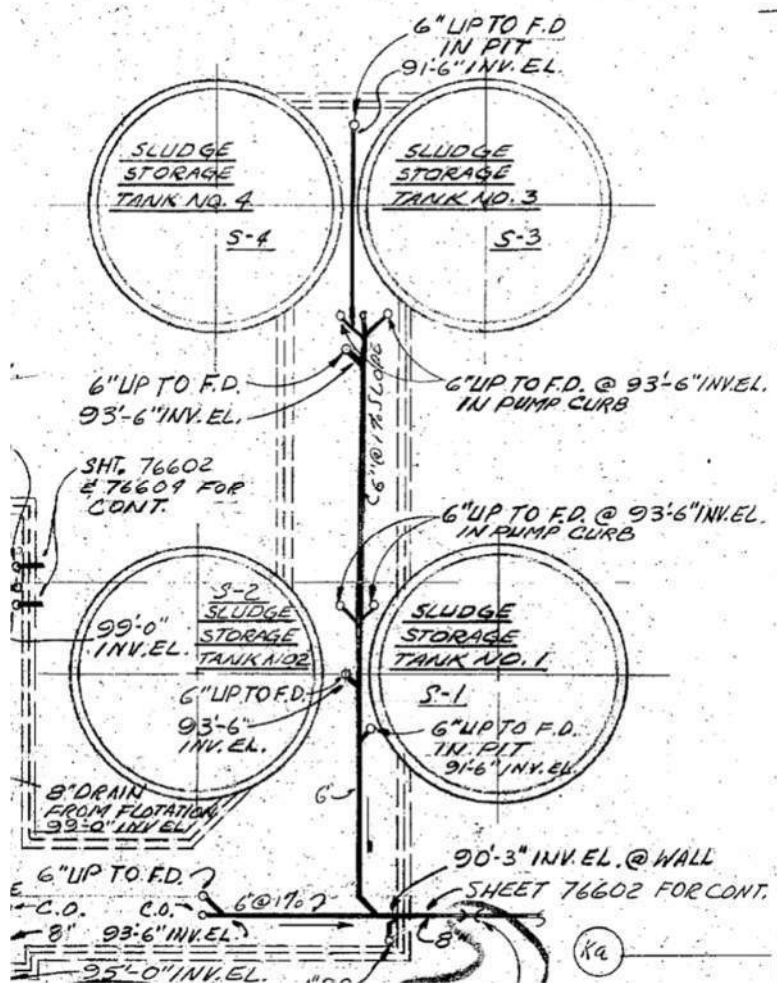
SSTs 1-4 Pipe Gallery Floor Drains and Drain Piping
